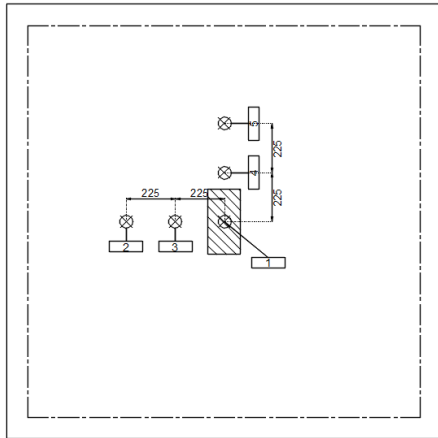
Position of LVDT on a Typical Specimen (Dimensions in mm)
